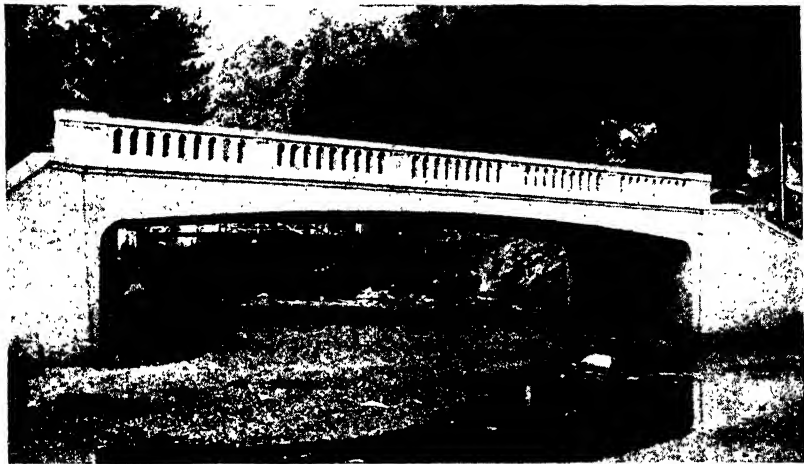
Rigid-frame Bridge with Wing-wall Abutment.
